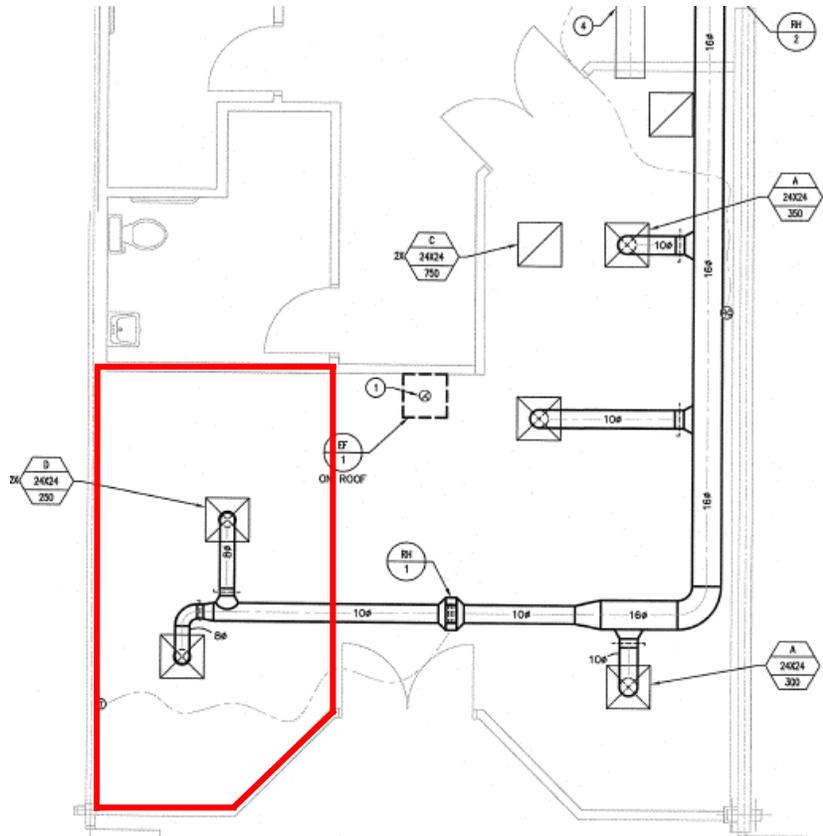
Drawing of FibreCITY lab, area with drywall ceilings outlined in red [13]
